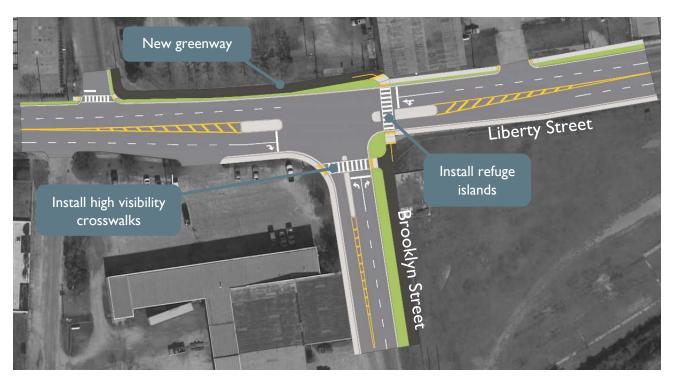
I I | Liberty Street/Brooklyn Street Intersection Conceptual Improvement
